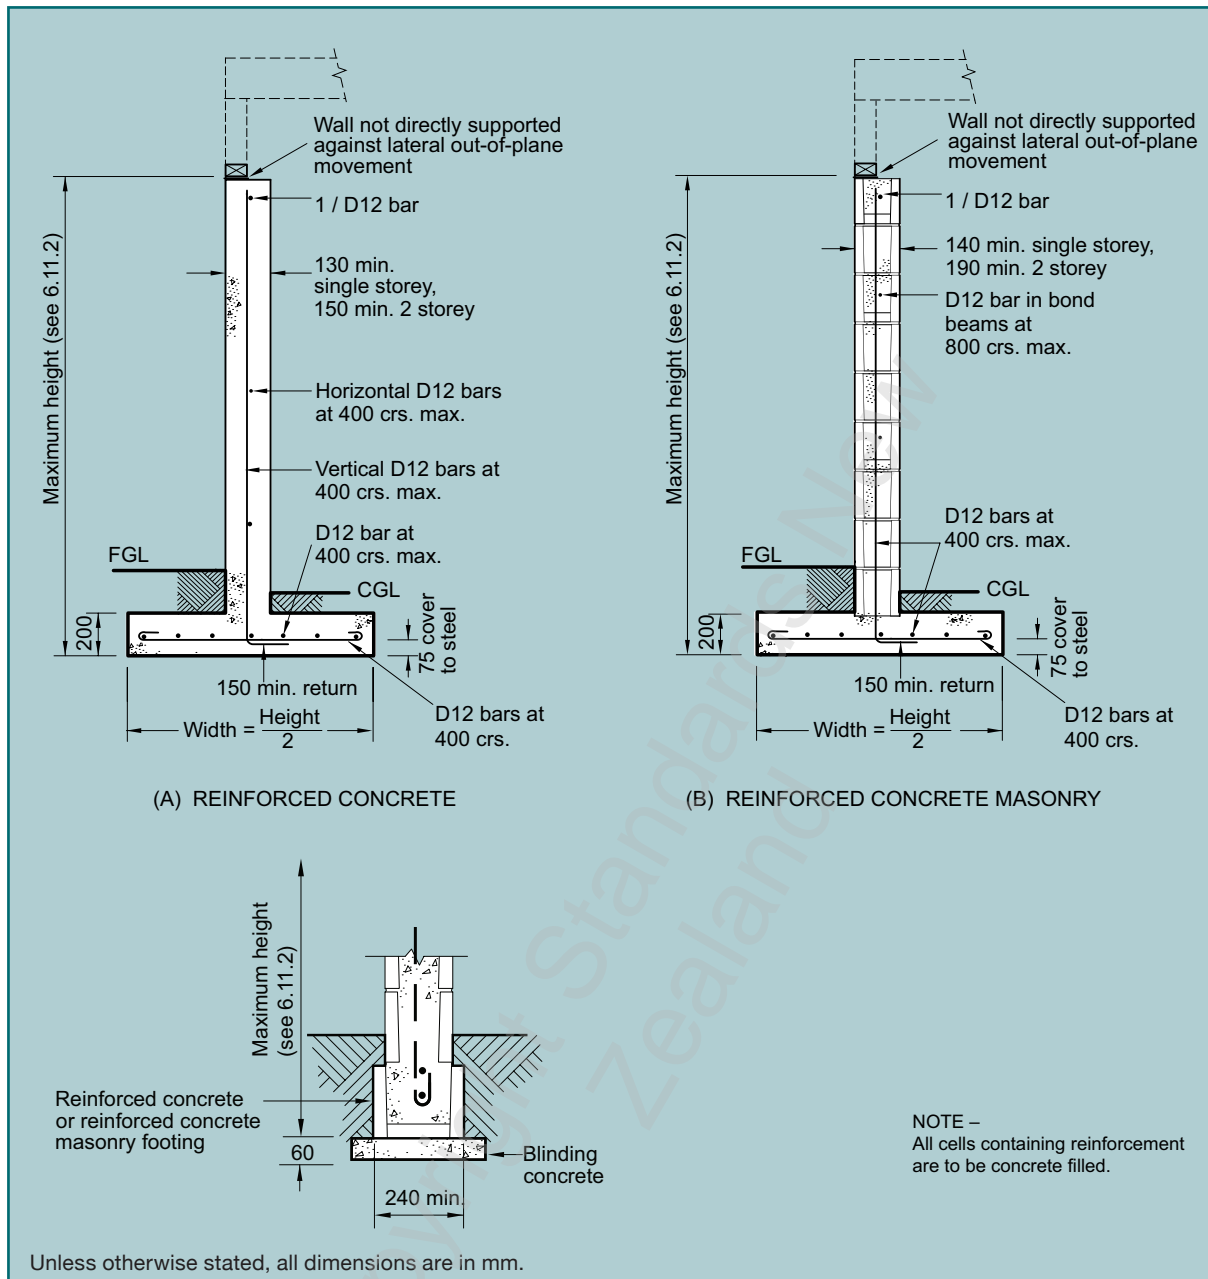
Cantilevered foundation walls (see 6.11.3, 6.11.4.2, and 6.11.7.1)
